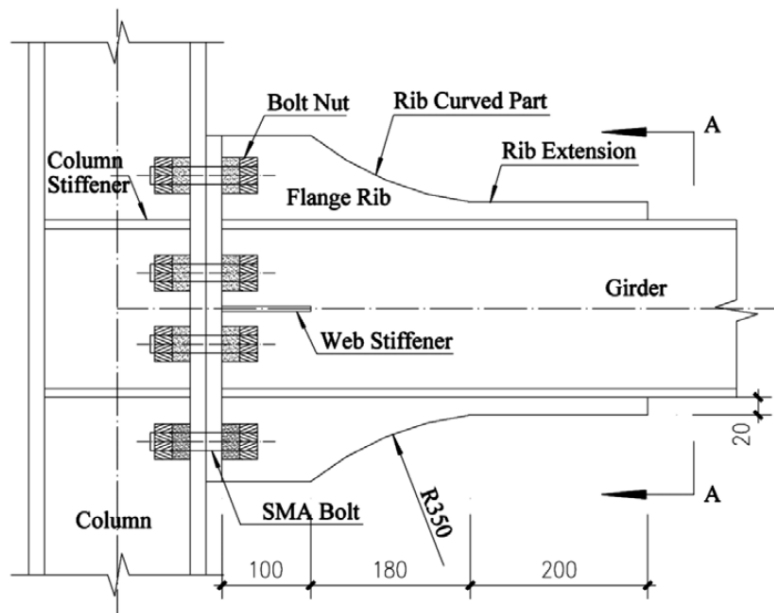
Beam-to-Column Connection with SMA Bolts (Ma et al., 2008)
